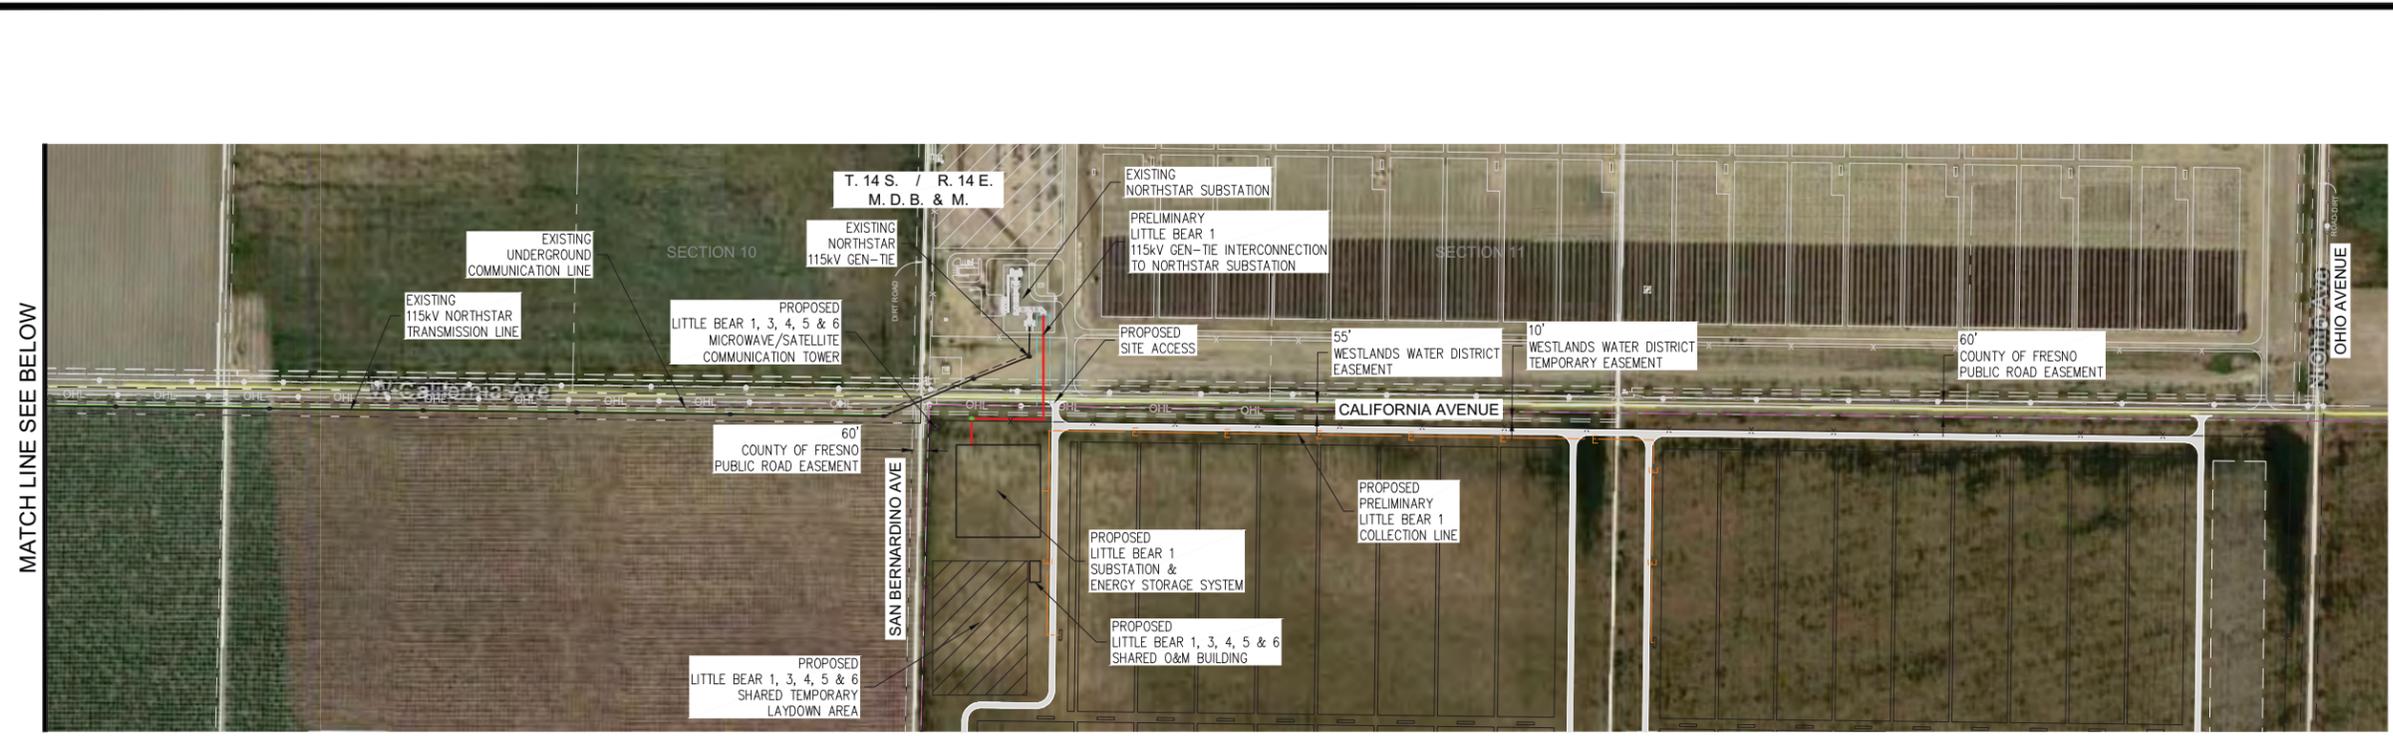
LITTLE BEAR 4 SITE PLAN
